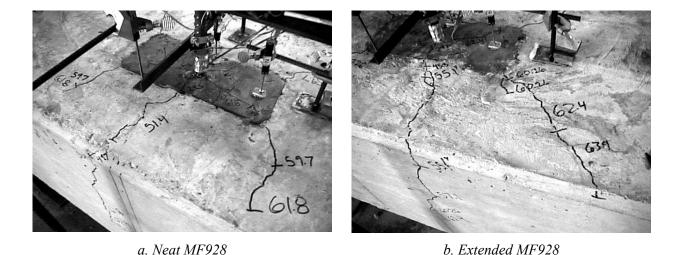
Crack Pattern for Neat and Extended Grouts (SL07 and SL08)
